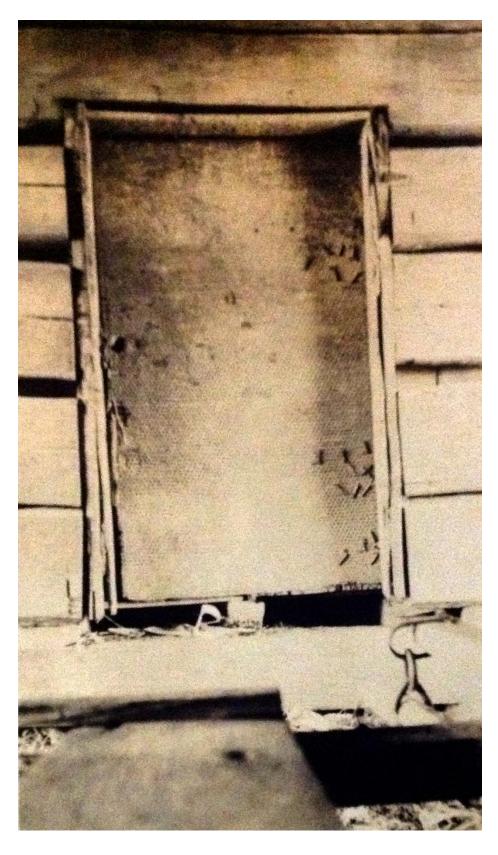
1934 DAR Photograph of Nailed Door at Bridges Site
